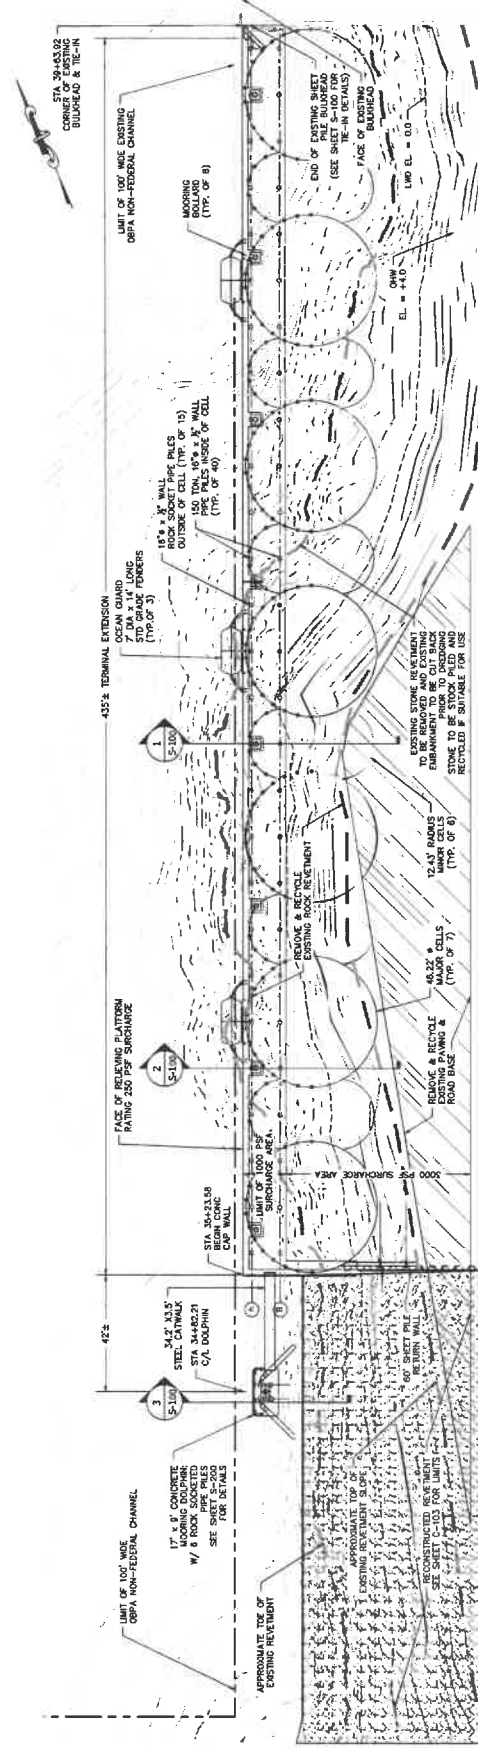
Cellular Bulkhead Design Layout and Section
